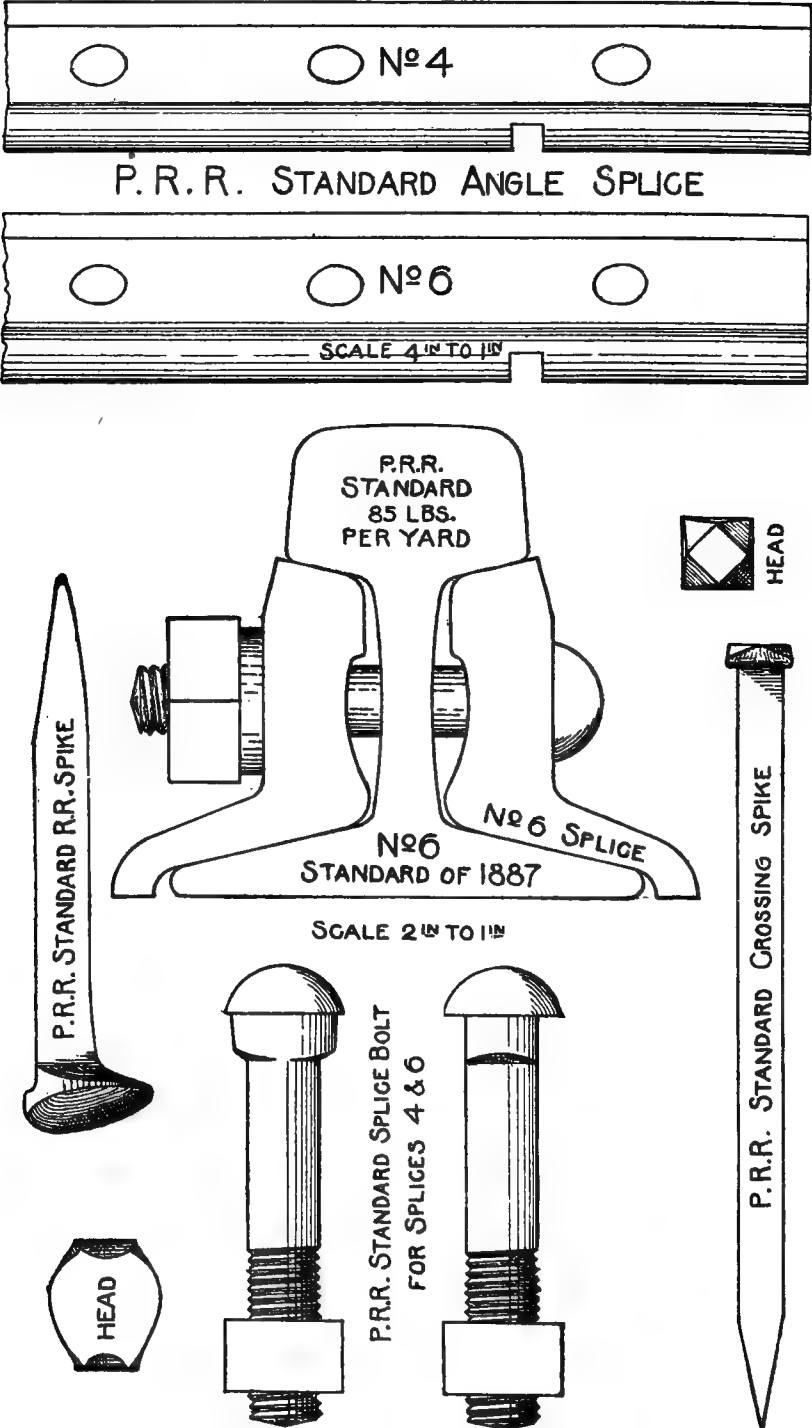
Heavy rail and fastenings used on the Pennsylvania Railroad.
